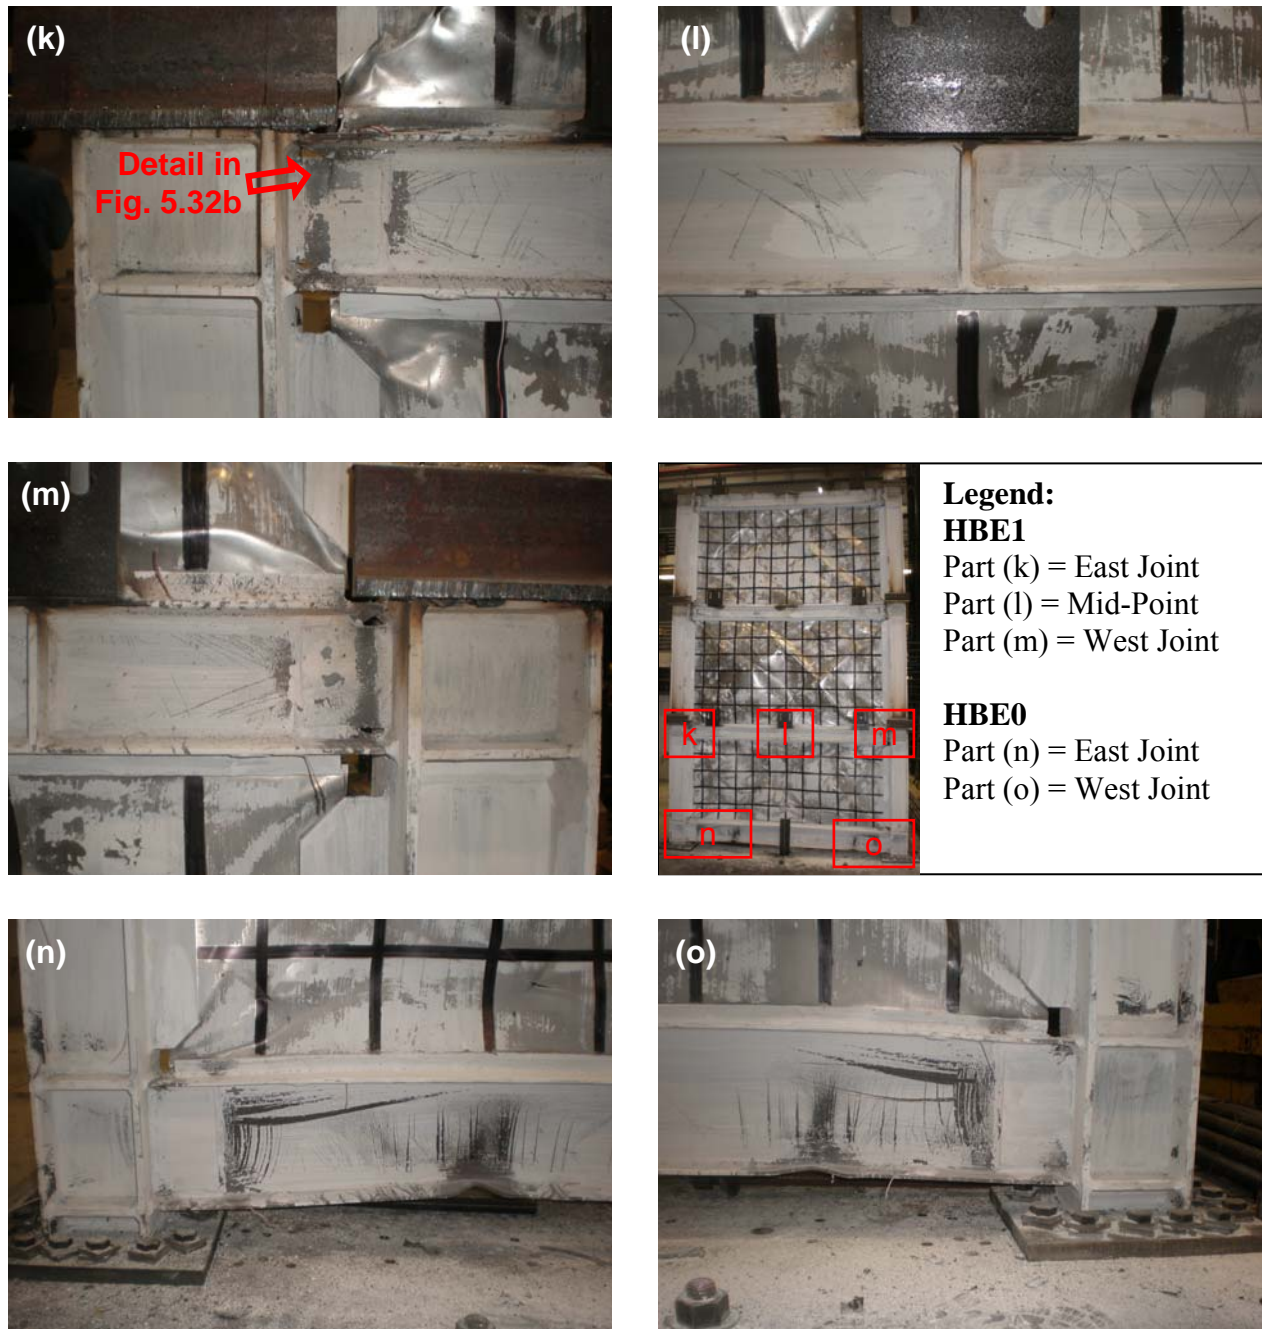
Details of Specimen Final Condition – Cont’d: (k) to (m) HBE1 (North Side); (n) & (o) HBE0 (North Side)
